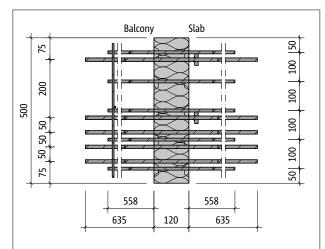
Schöck Isokorb® XT type C-R-M1-V1: Product plan view
